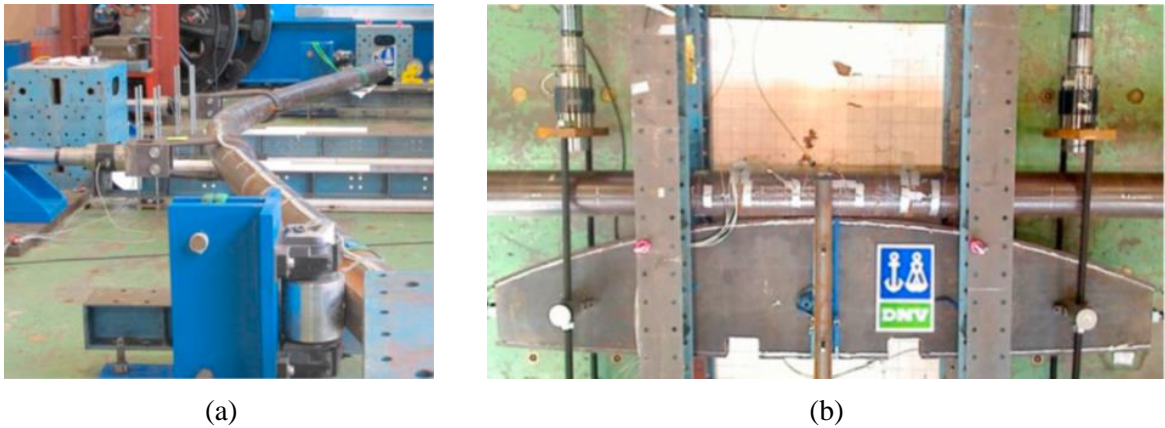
(a) Four-point bending test; (b) reeling test [13].
